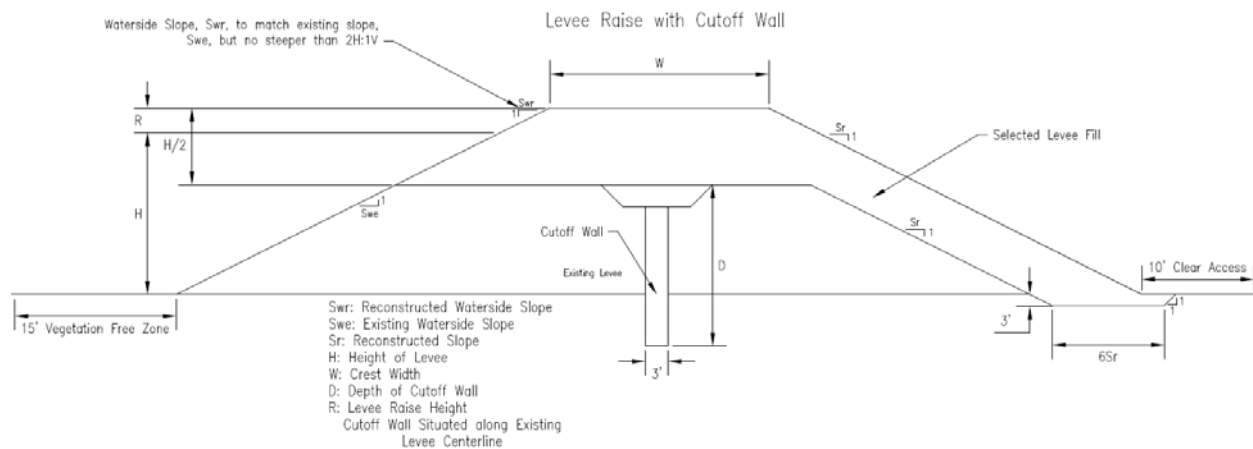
Template Option 2 – Centerline Cutoff Wall
